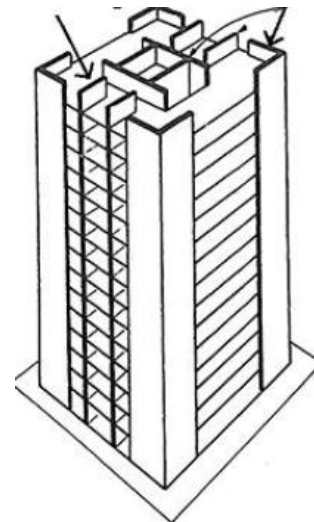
A tall building braced by individual shear walls and combined shear wall units.
